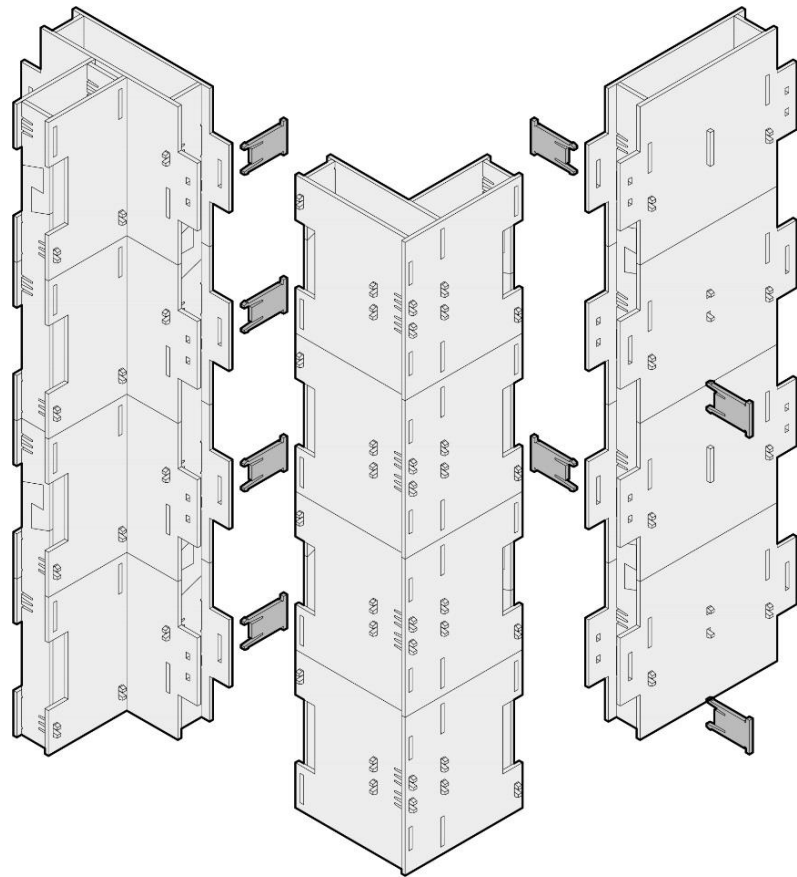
Exploded View of a typical straight wall assembly showing the internal and external components of the construction system.
